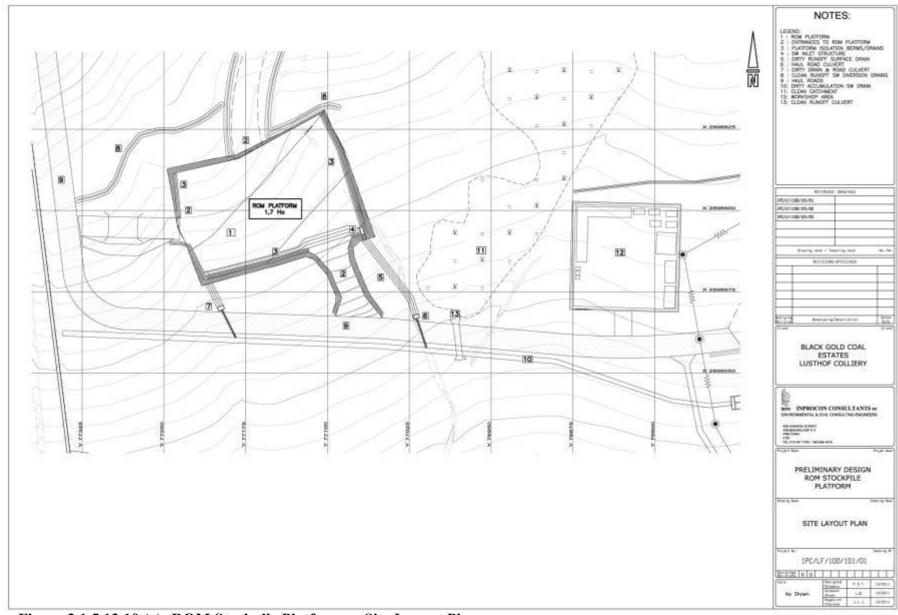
(a): ROM Stockpile Platform - Site Layout Plan.
